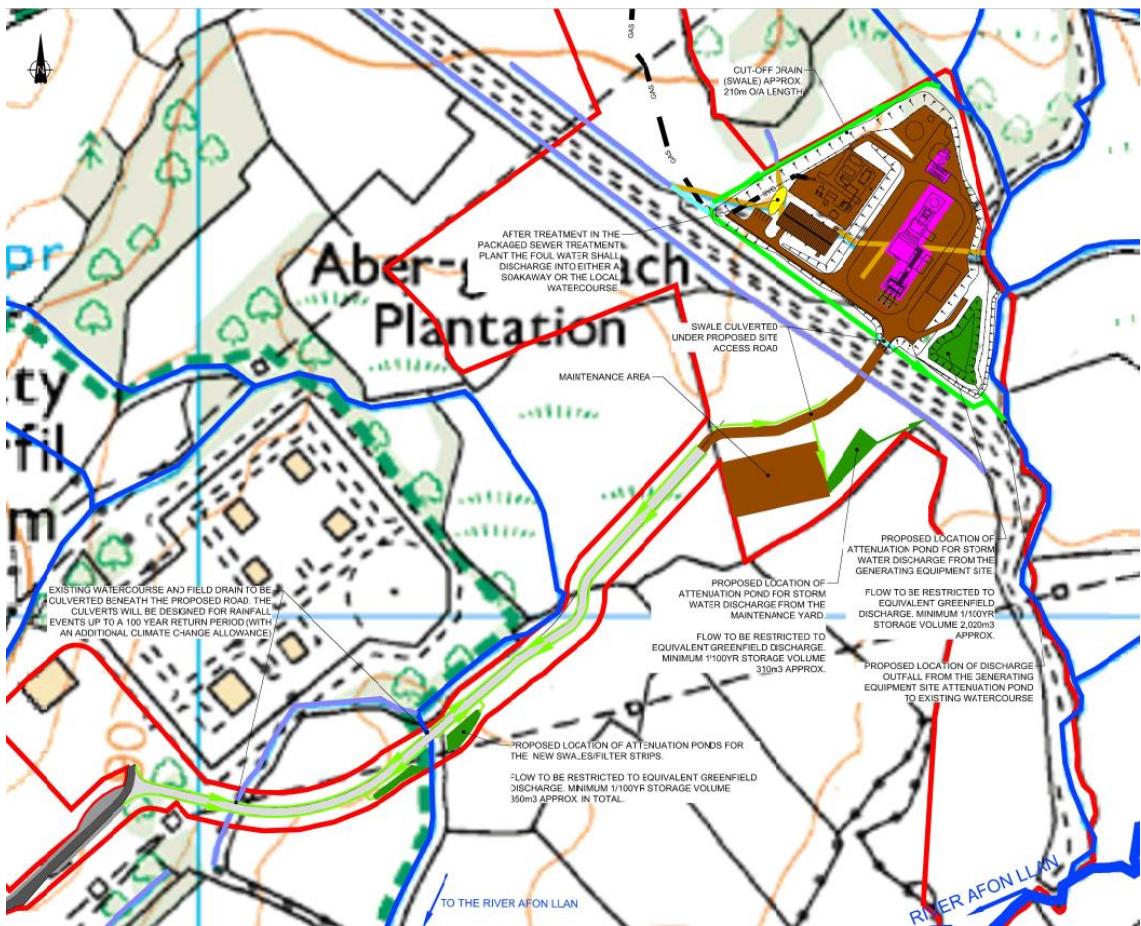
Plan showing nearby drains and watercourse to the site (Central section)
